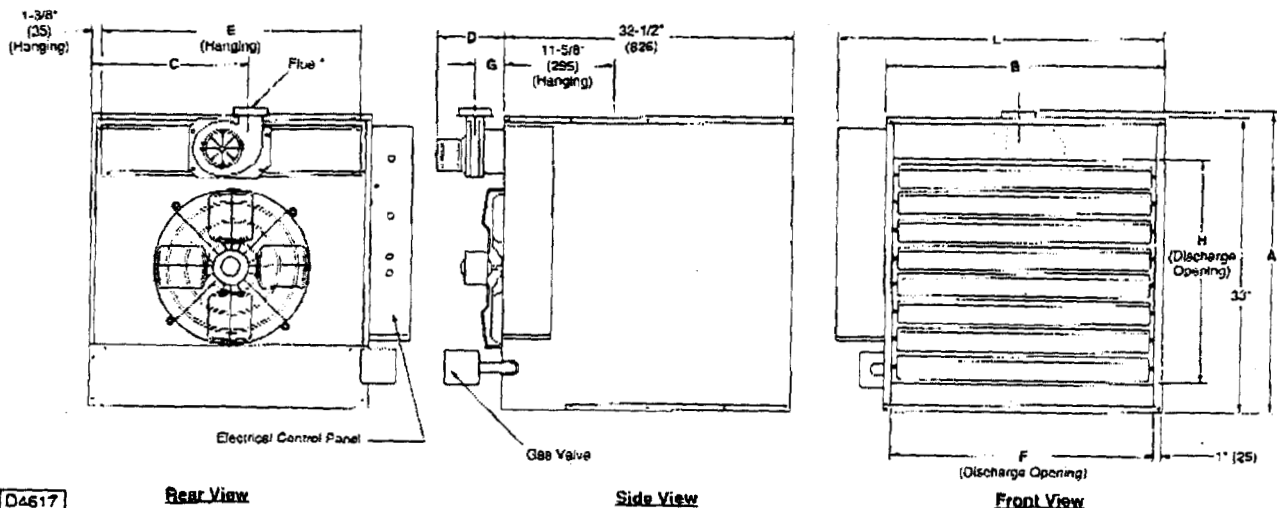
Dimensional Drawing - Tubular Propeller Unit Heater
